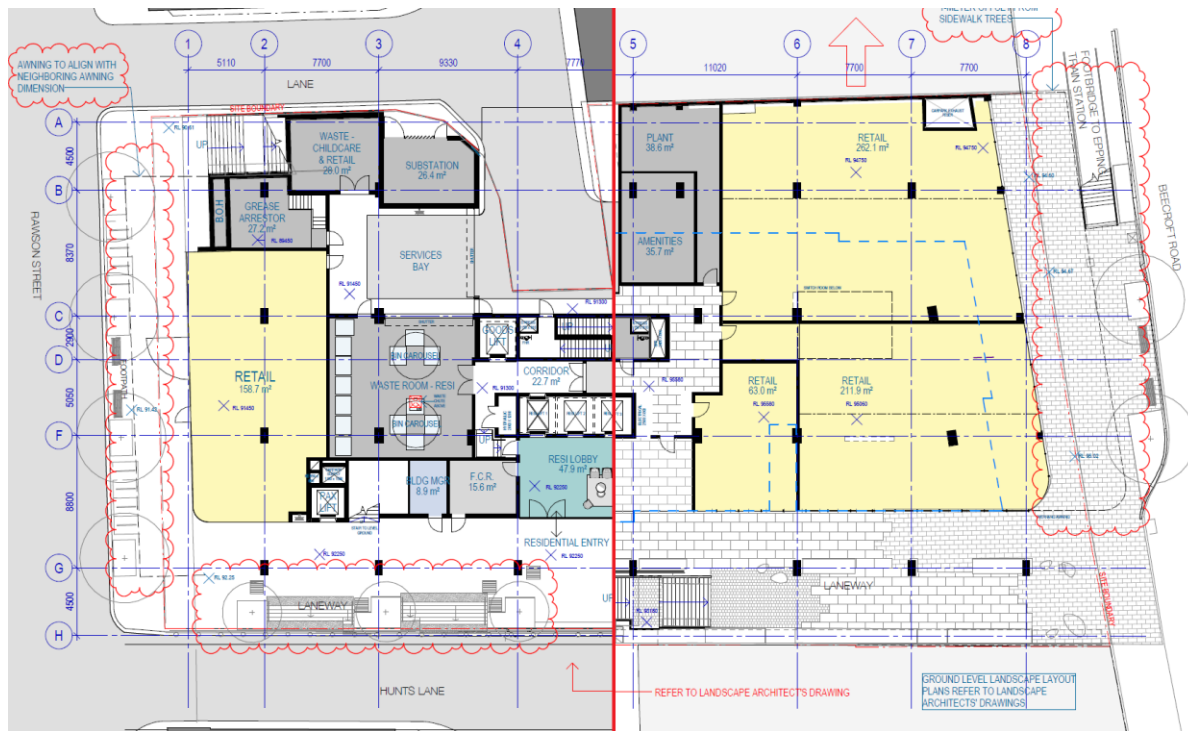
Proposed Lower Ground Floor - Rawson Street Frontage (left) and Proposed Upper Ground Floor – Beecroft Road Frontage (right). Red line represents split between levels.
